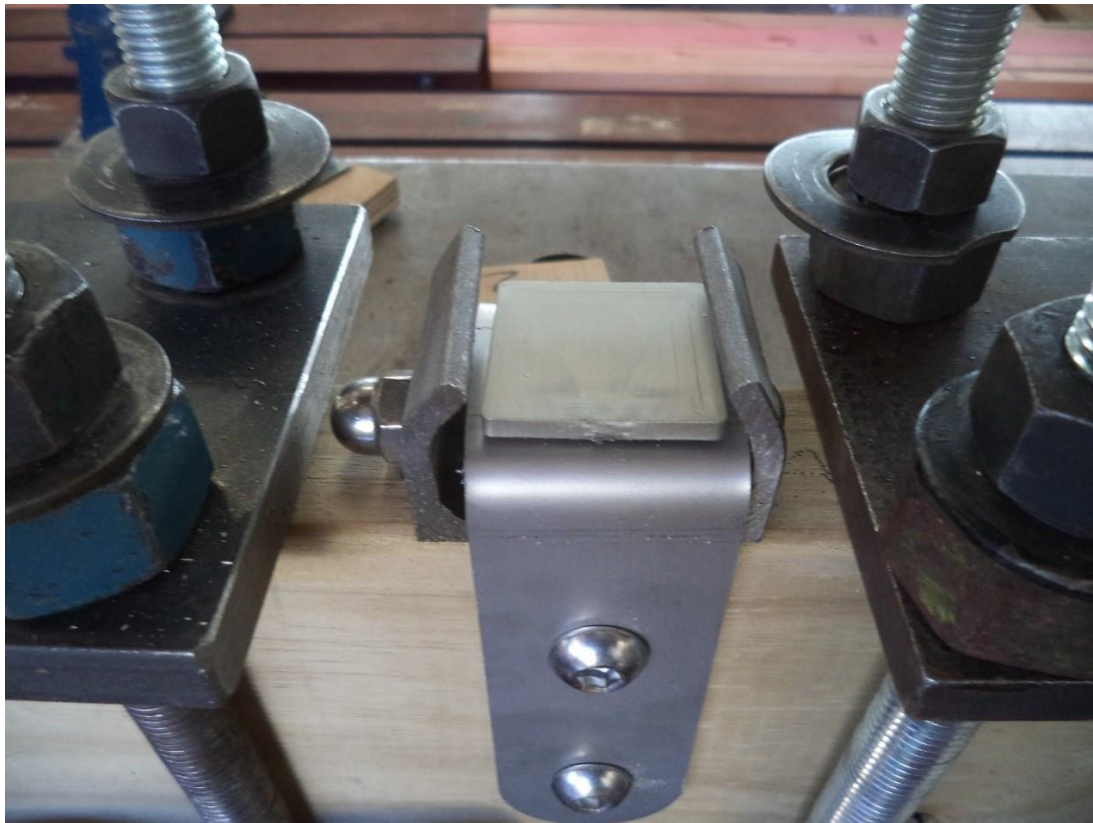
Specimen No. 278134 Rafter / Purlin connection bracket in test rig after failure had occurred.
